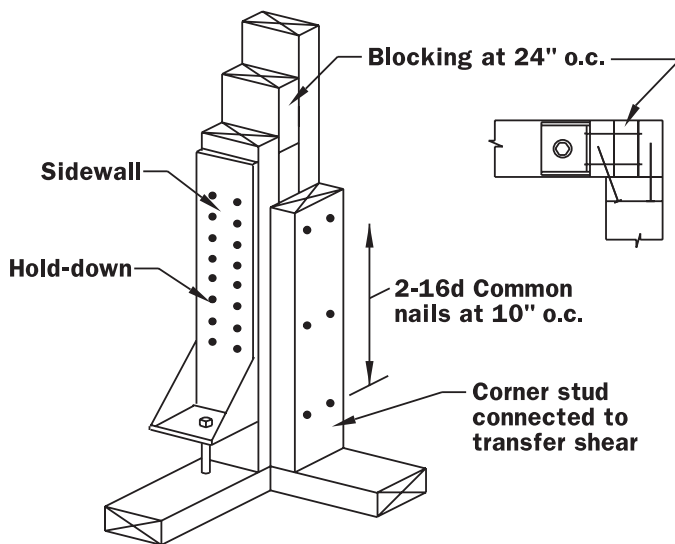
Corner Stud Hold-down Detail - 4 Studs
